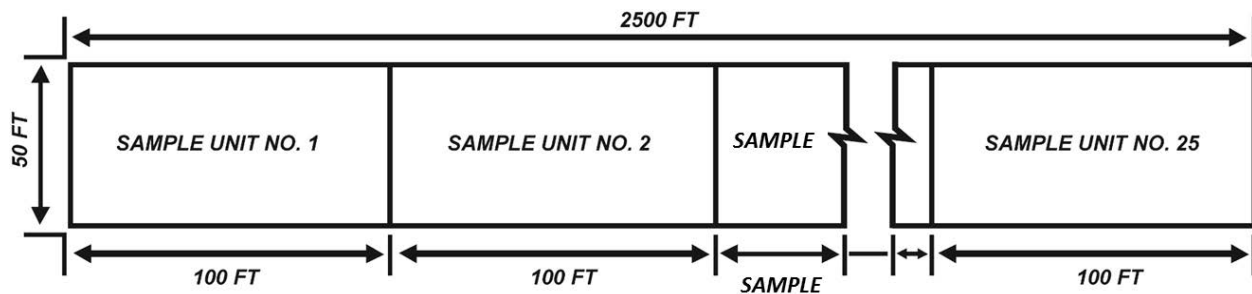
Example Division of a Flexible Pavement Section into Sample Units
